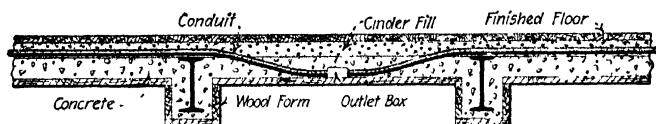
Position of conduit and box in floor. Conduit placed before pouring of floor slab. Compare with Fig. 300.
